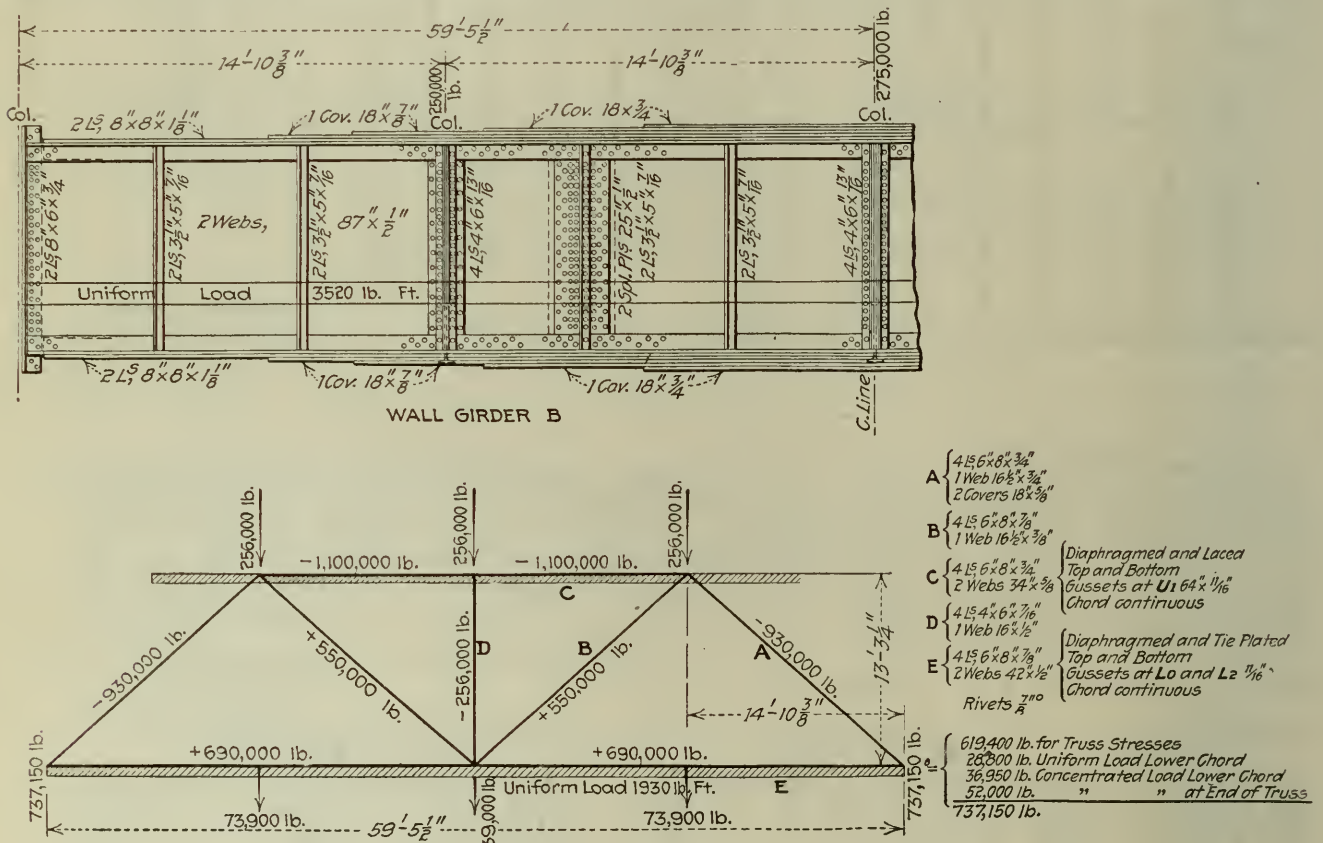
TRUSSES AND WALL GIRDERS TO SUPPORT UPPER COLUMNS
